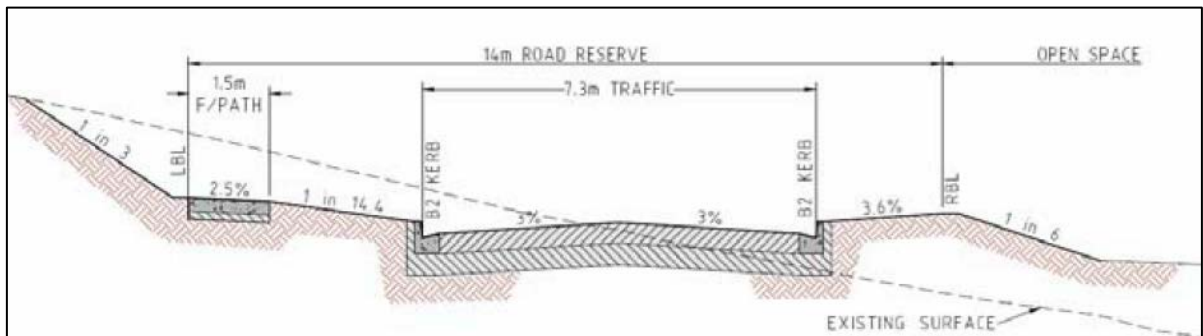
Local Access Street Cross-Section – Open Space Frontage (14m)
